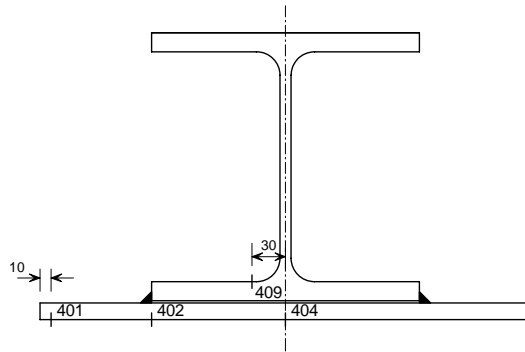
Internal beam transverse arrangement of thermocouples at position CA
